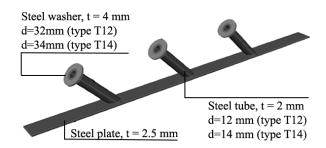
Geometry of connection Type T (Crocetti, Sartori, & Tomasi, 2014)
